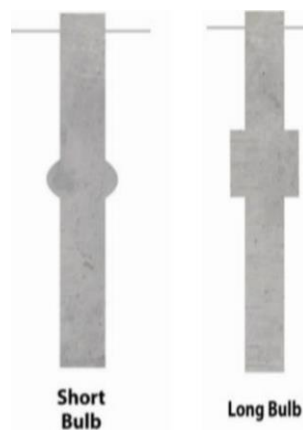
2 Bulging deformation in pile structure (Olson instrument, 2012)
